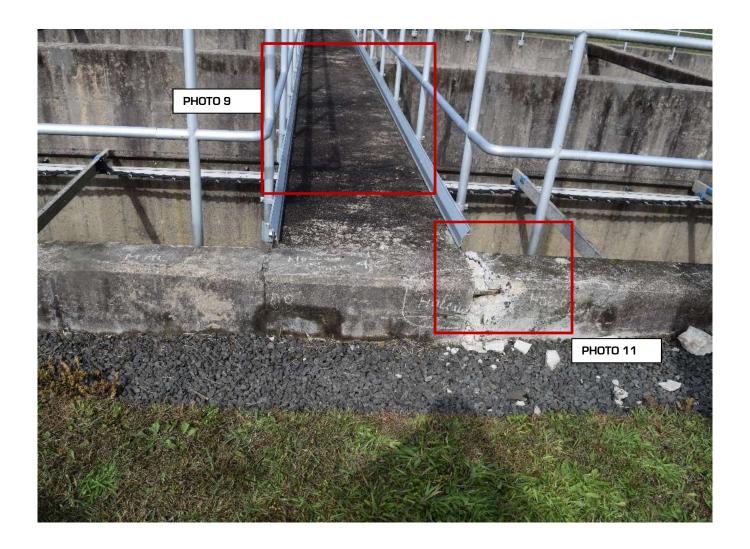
South Wall of Basin No. 2 at Center Bracing Strut/Catwalk (Looking North)
